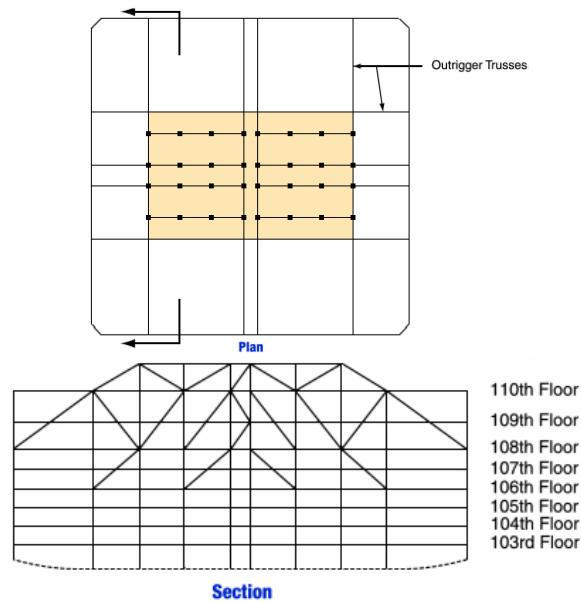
Outrigger truss system at tower roof. FEMA report 2000
